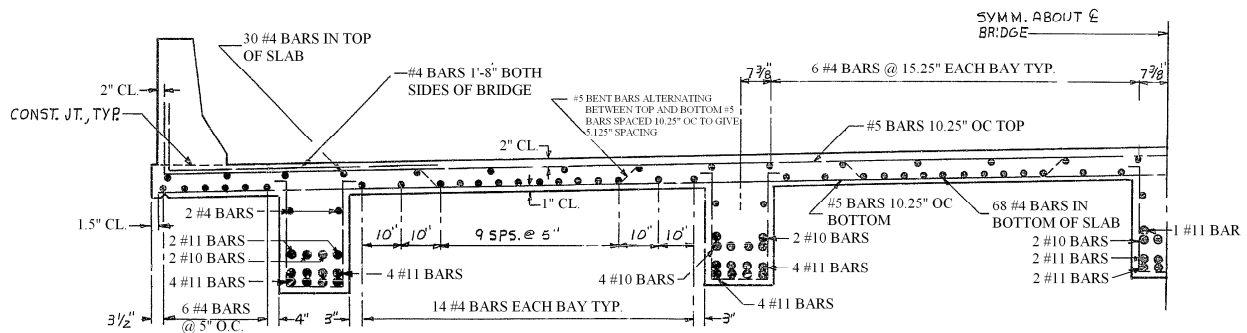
Deck and Girder Cross Section, Showing Reinforcement Details (Ref. GDOT Drawings)
